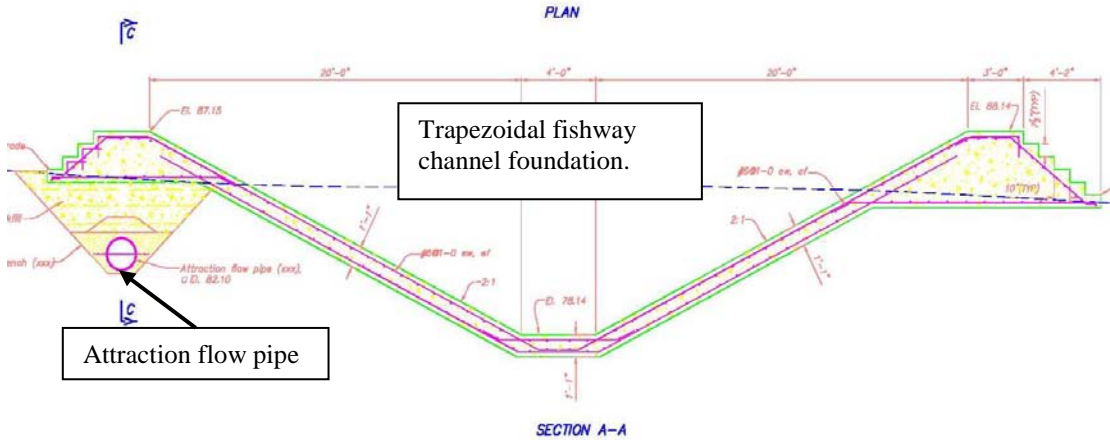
Cross section showing the trapezoidal shape of the rock channel at the embedment point of the foundation for future features and the location of the attraction pipe.
